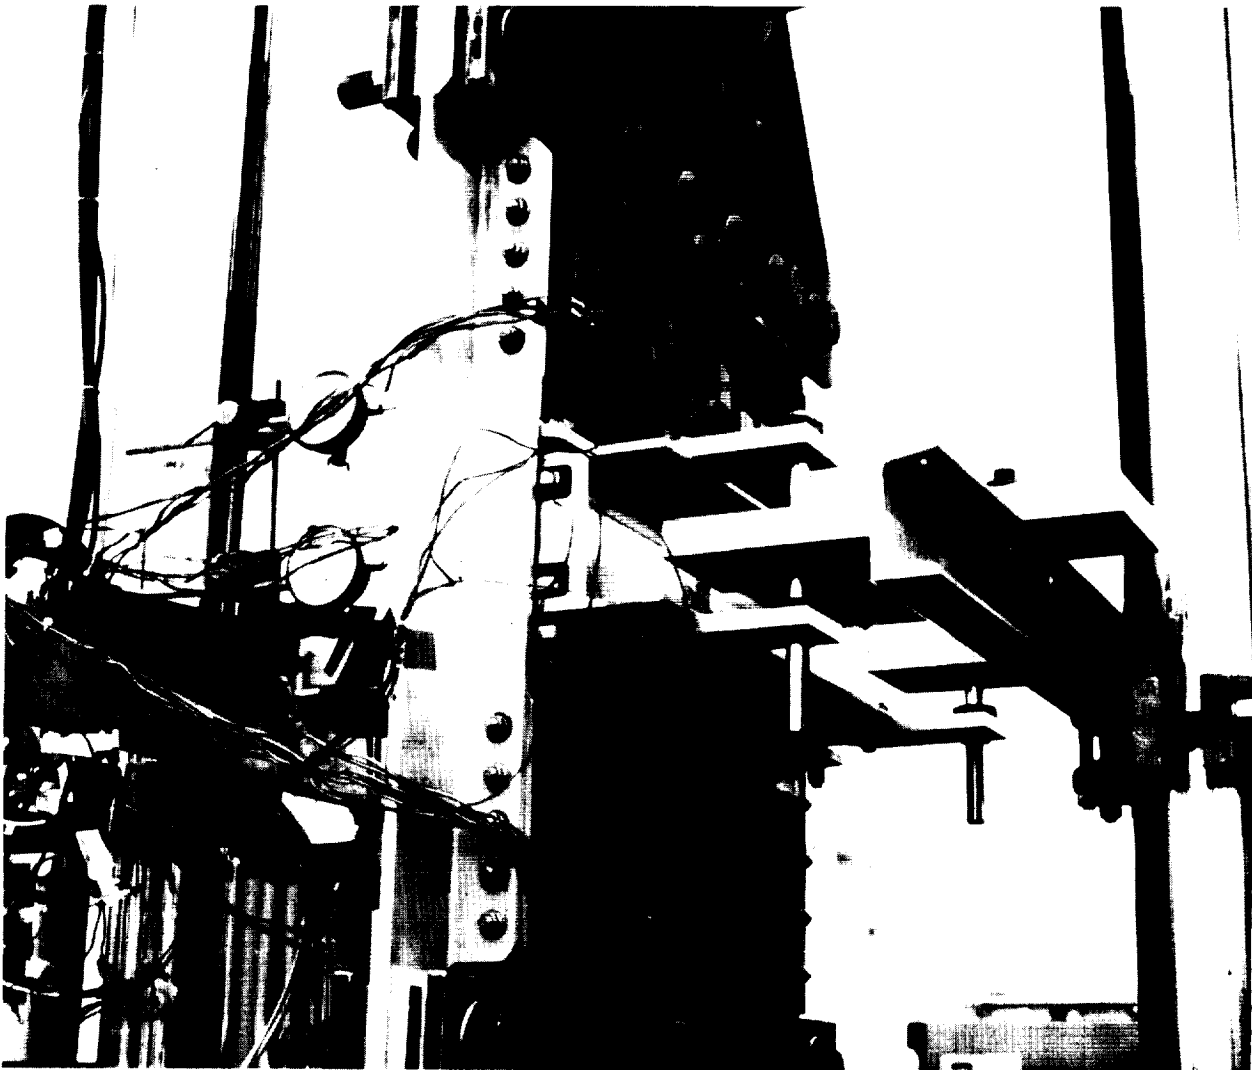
VIEW OF INITIAL RIB SUPPORTS WITH ONE ATTACHMENT TO THE
